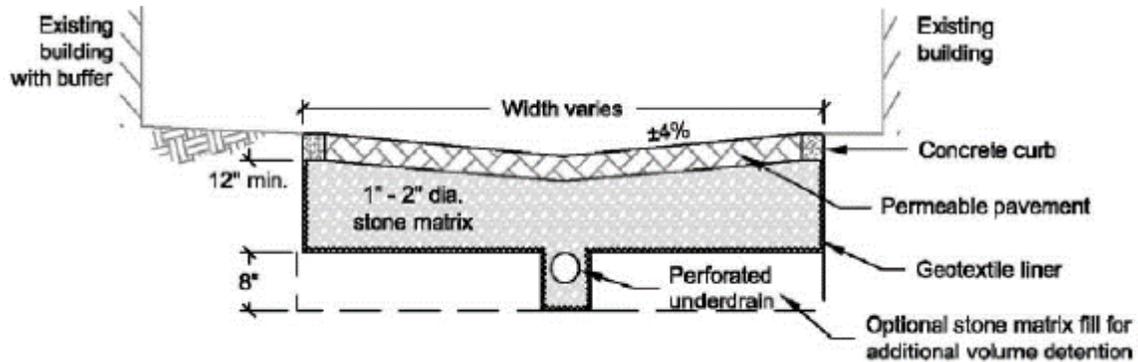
Example Permeable Pavement Design near Existing Buildings
